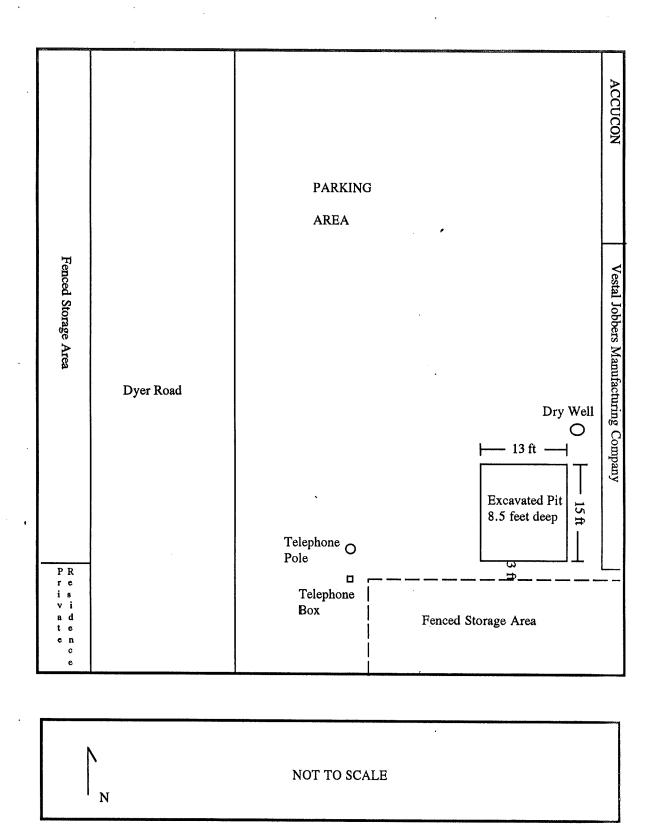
Site plan showing locations of excavation pit in relation to the building.
